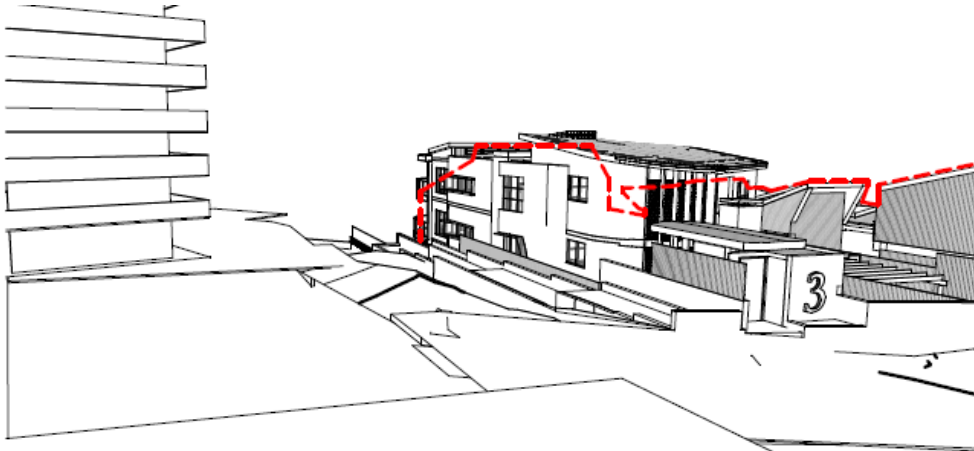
Plan Extract: Level 1 balcony view from 4 Lauderdale Avenue.
